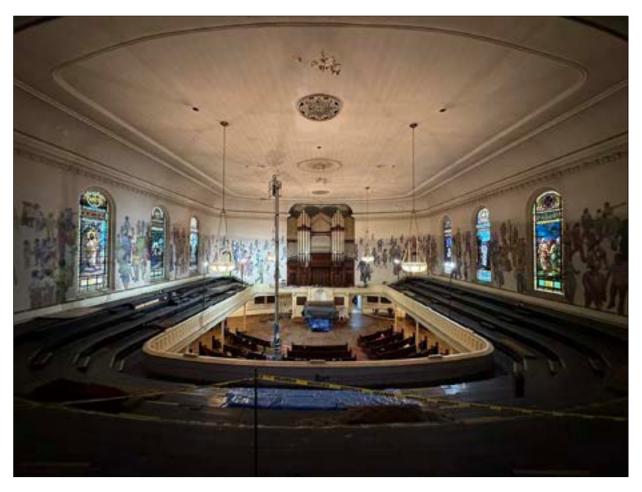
Overview of ceiling and survey methodology, looking south from choir loft.
